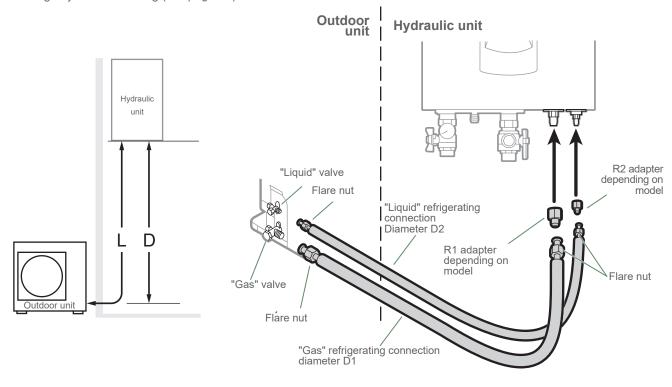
Refrigerating link connection (accepted diameters and lengths)
